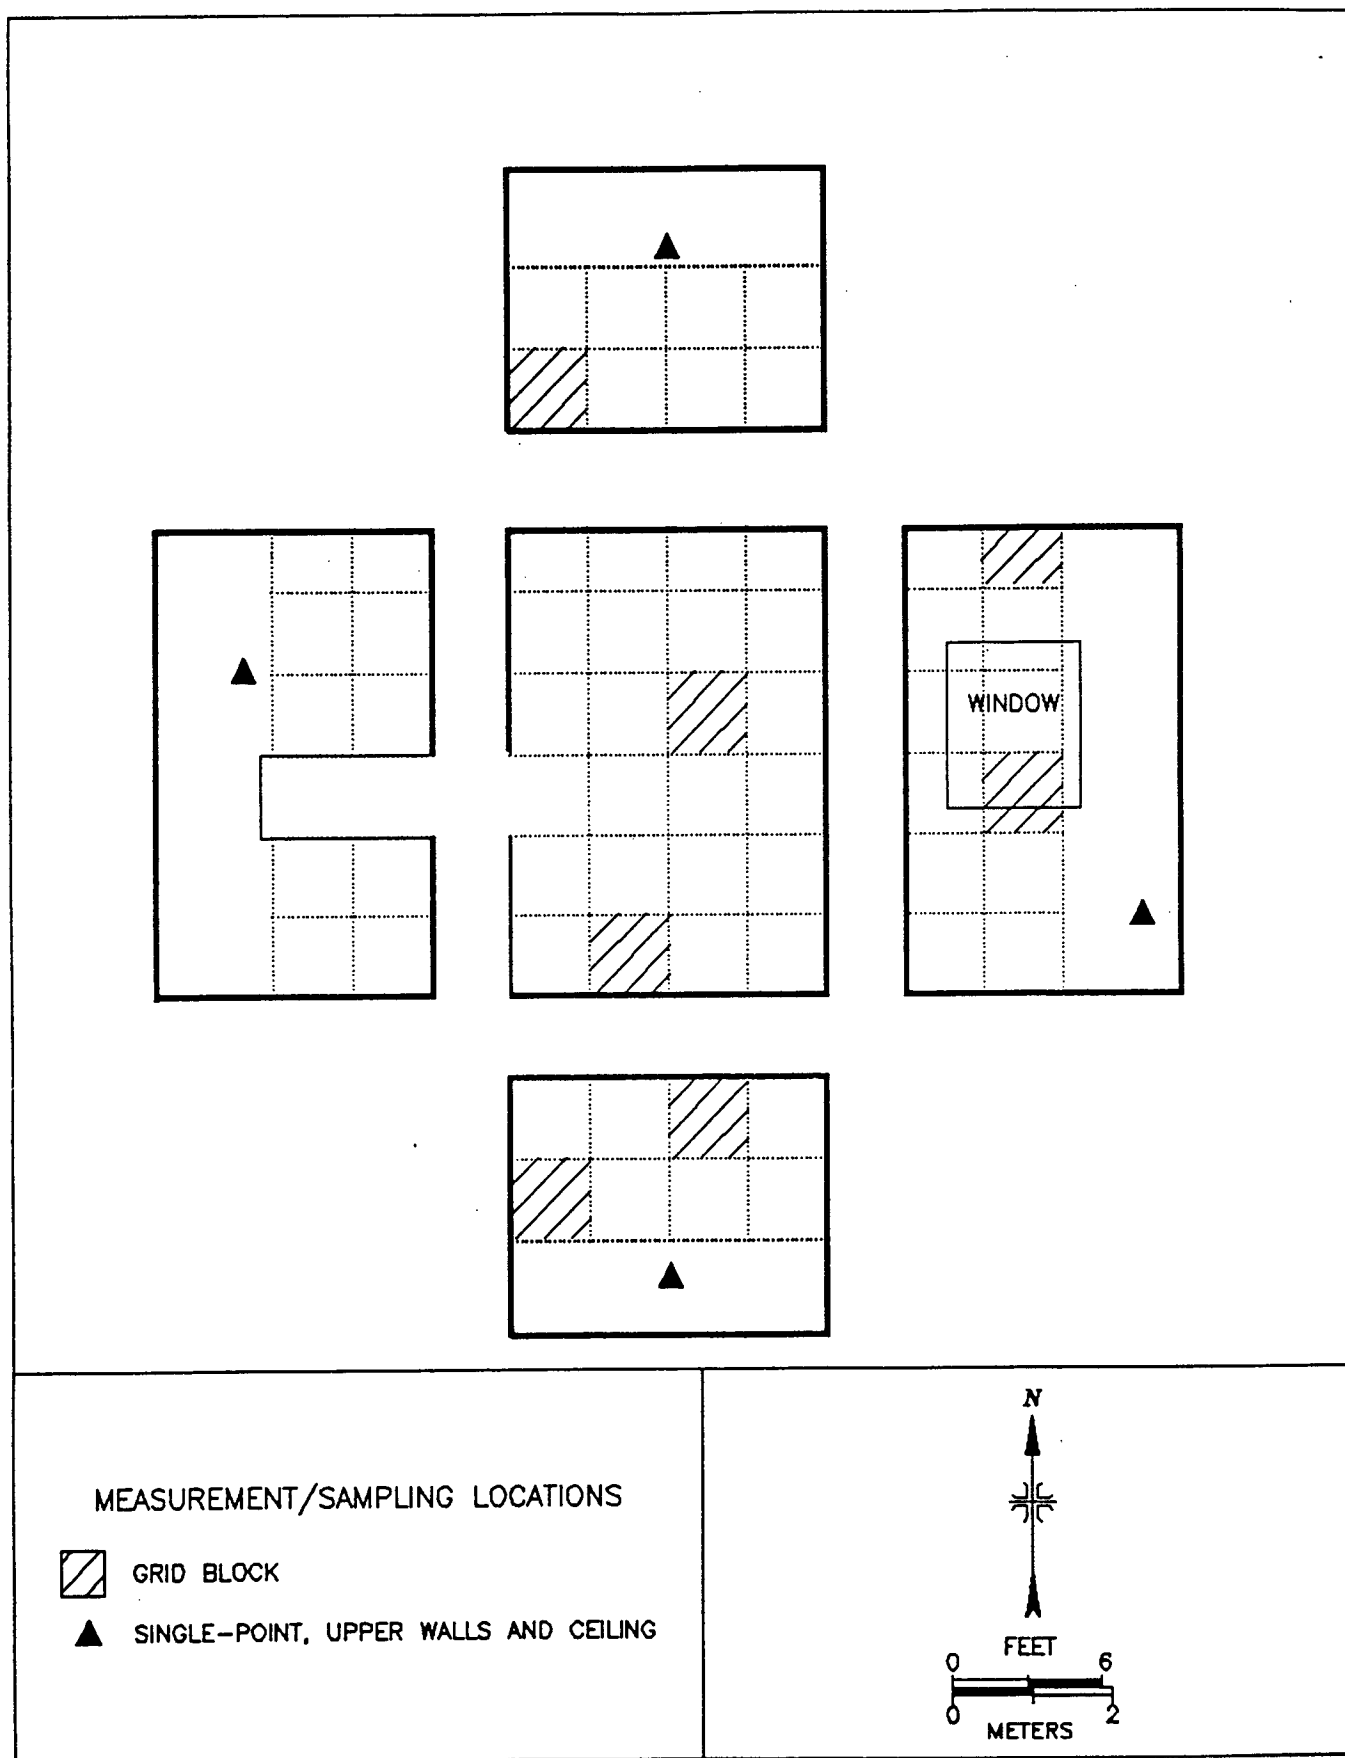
Building 401A, Room 12 – Measurement and Sampling Locations
